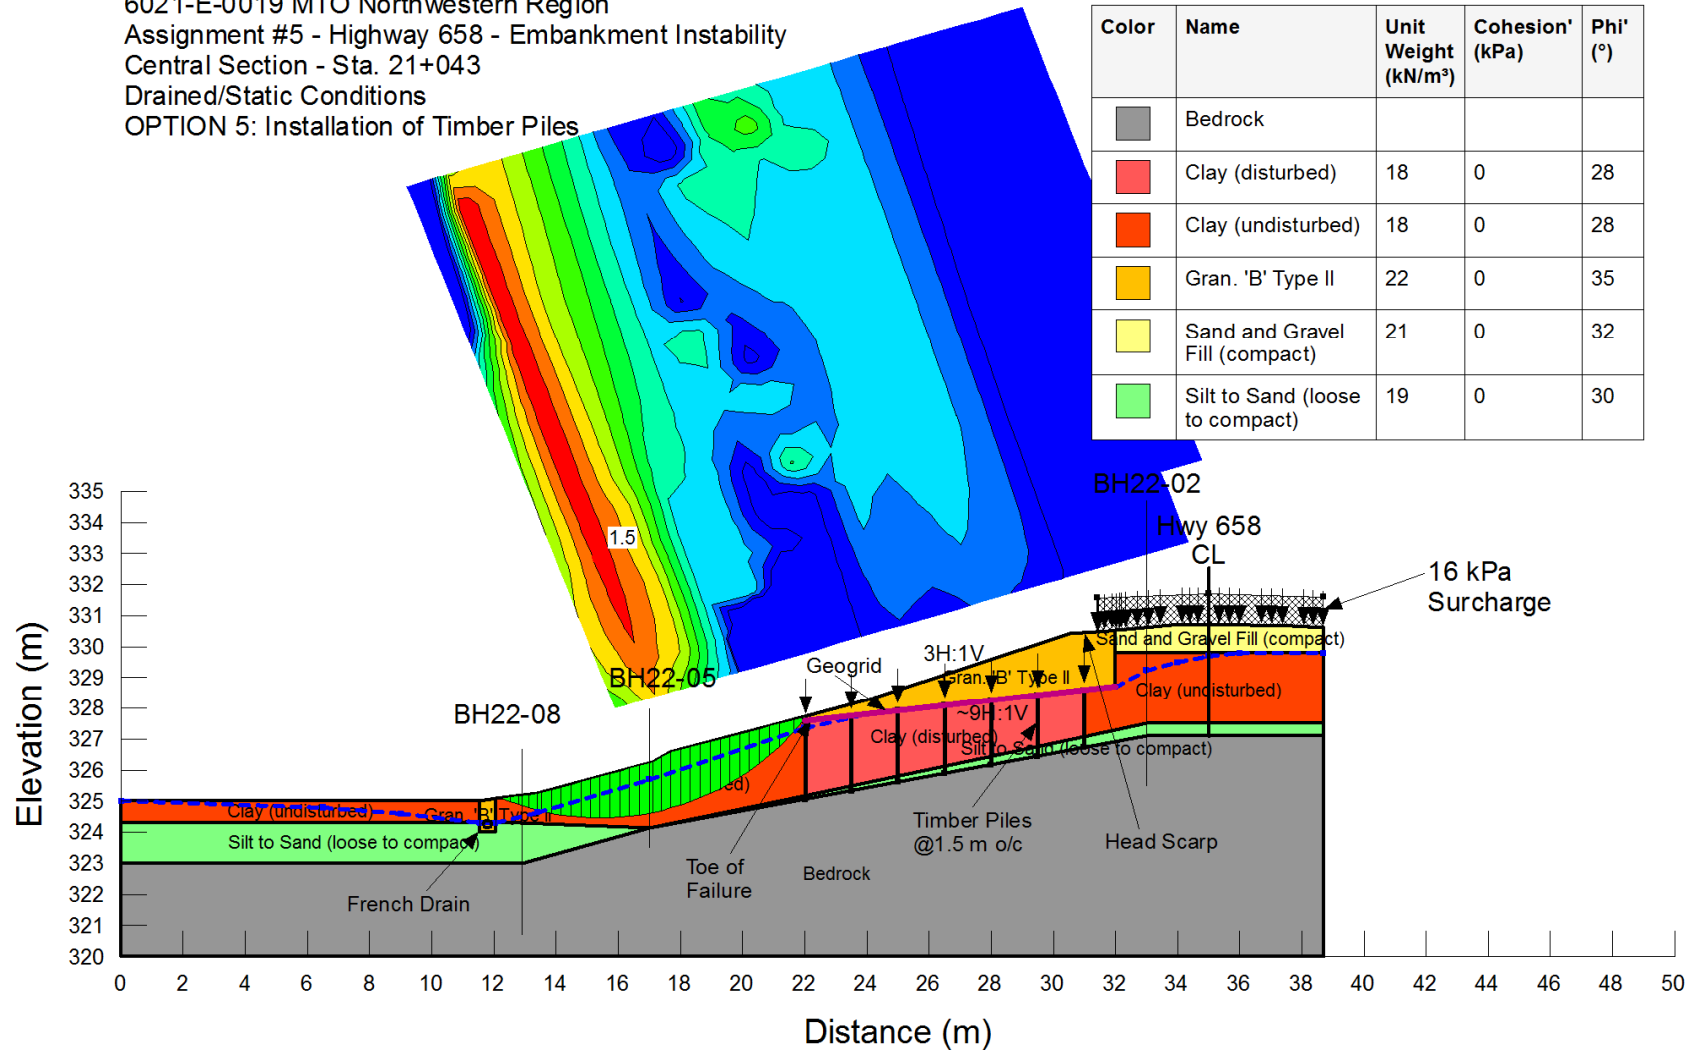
Central Section (Sta. 21+043) – Remedial Option 5: Installation of Timber Piles, Toe Failure – Drained Static Conditions
